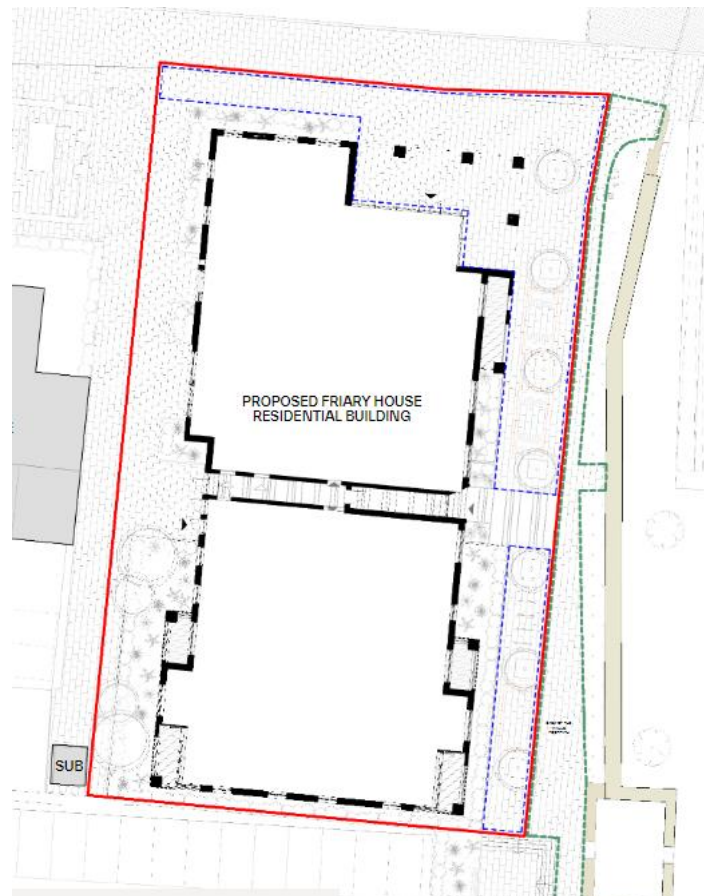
Extent of new Public Realm Created by the Narrower Proposed Building
